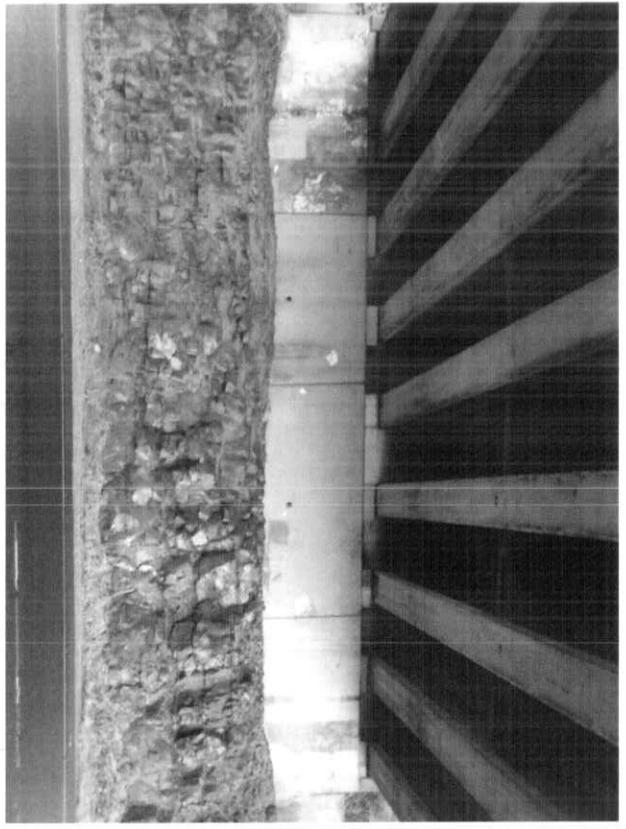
AREAS OF SEVERE SCALE ON WEST SIDEWALK.
